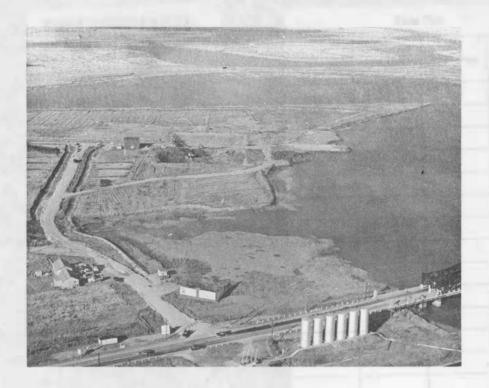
Tantramar River Dam, Westmorland Co., N.B. Aerial view of the project in the early stages of excavation, looking upstream. A corner of the bridge which will be replaced can be seen at lower right. The initial dam fill extends into the river at center right.
